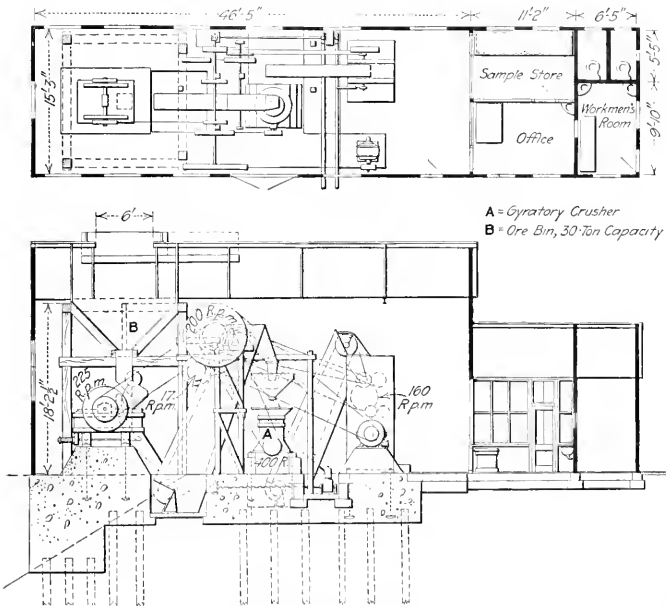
ARRANGEMENT OF THE SAMPLING PLANT
